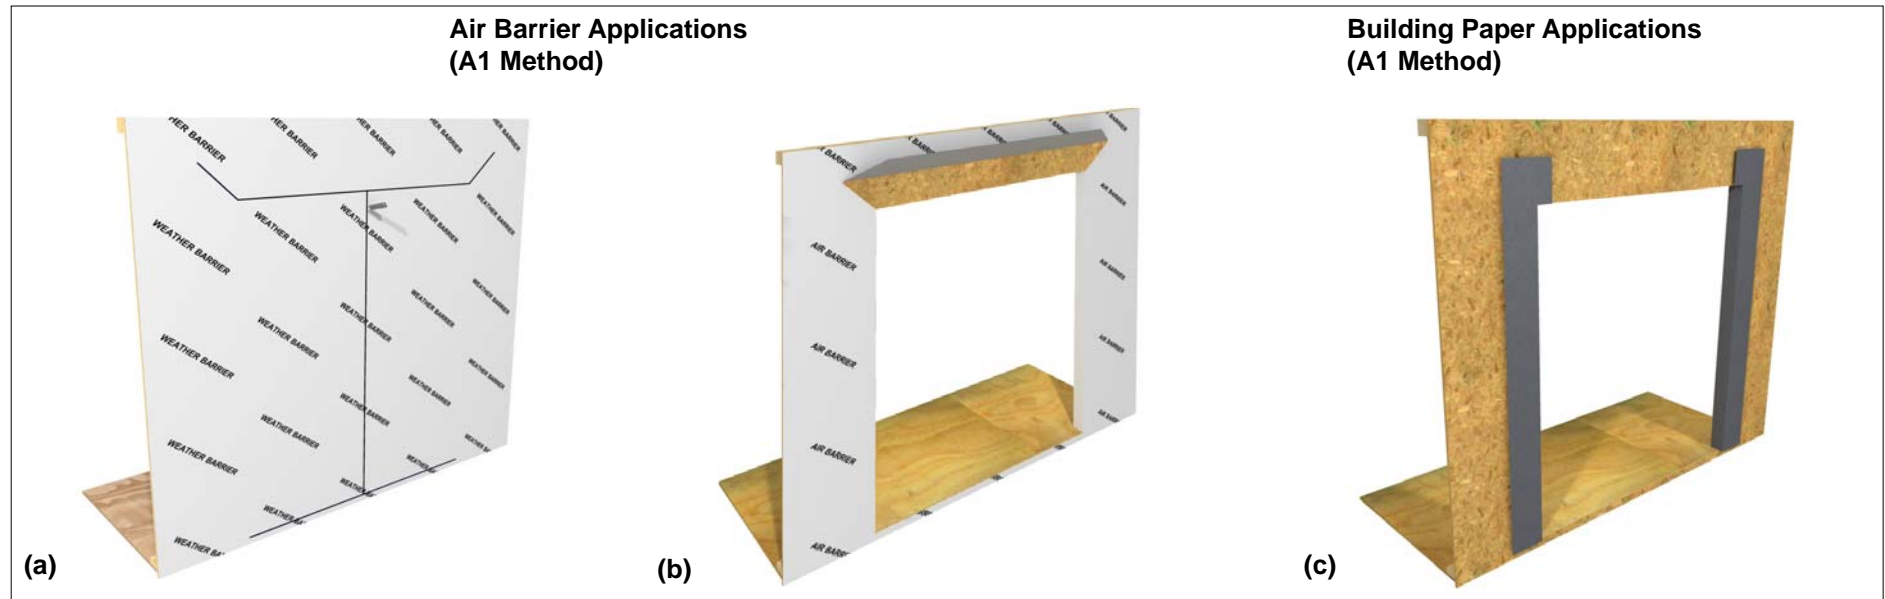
Rough Opening Preparation for construction methods using a continuous air barrier system or building paper.
